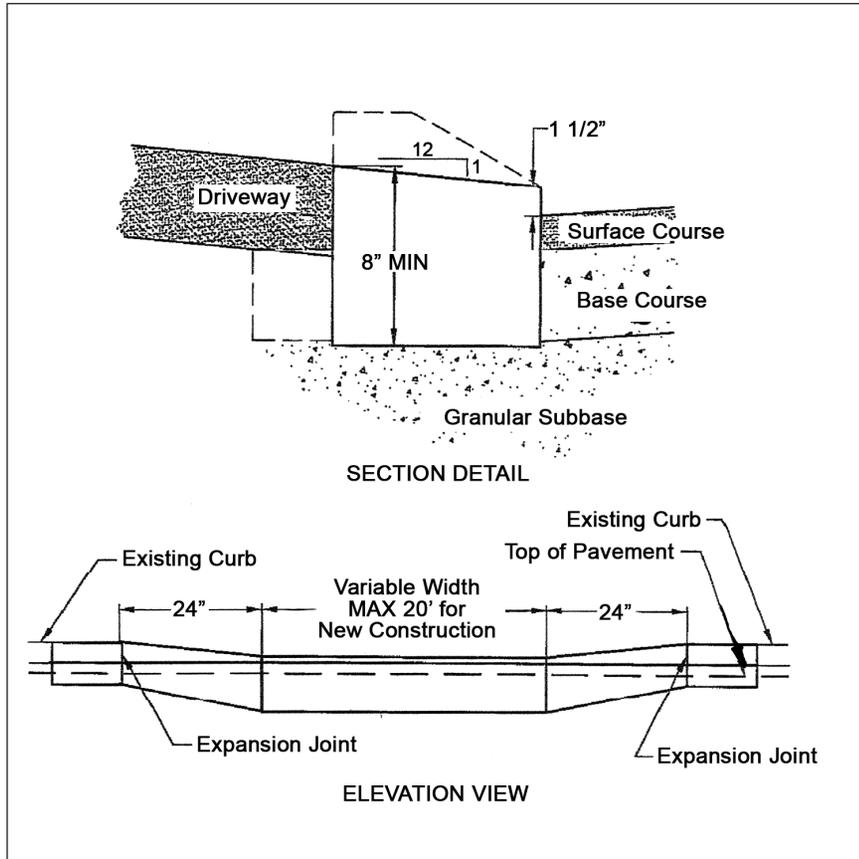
Driveway Curb-cut Detail for Extruded Curbs
